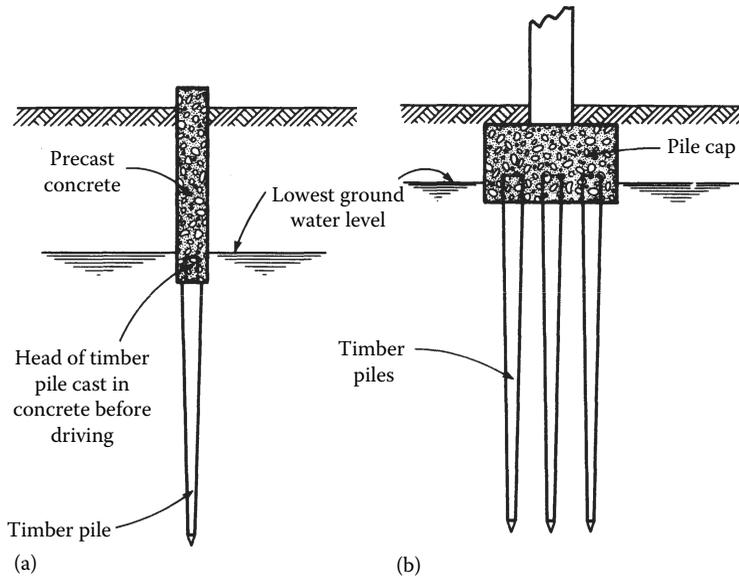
Protecting timber piles from decay by (a) precast concrete upper section above water level and (b) by extending pile cap below water level.
